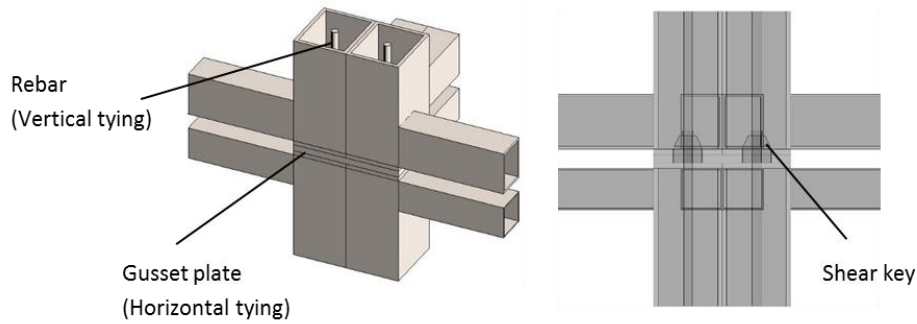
Joining technique using vertical reinforcement, shear key, and gusset plate.
